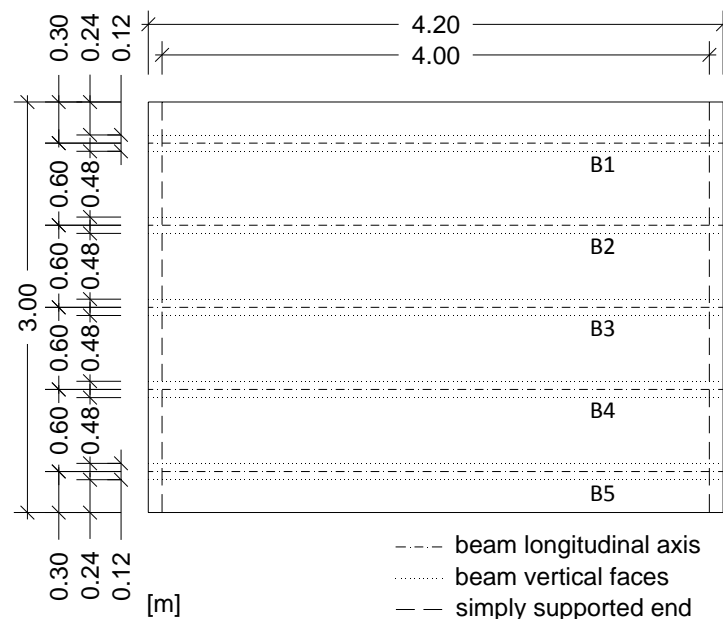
Plan view scheme: specimens S1 to S3
